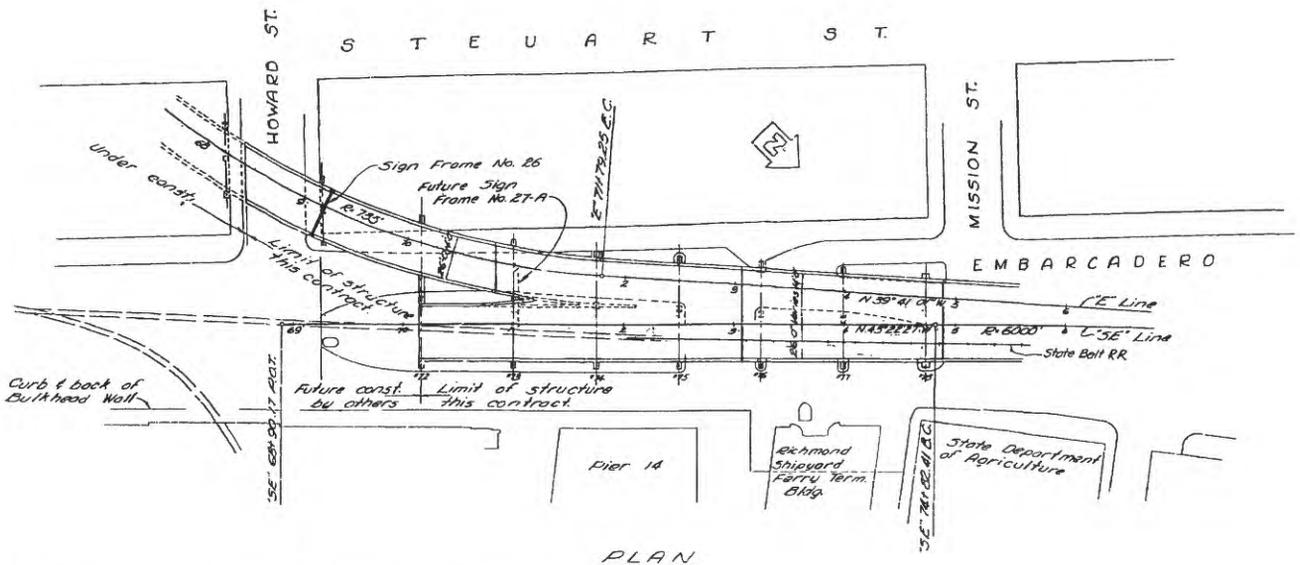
Structural Plan drawing for Embarcadero Viaduct.
